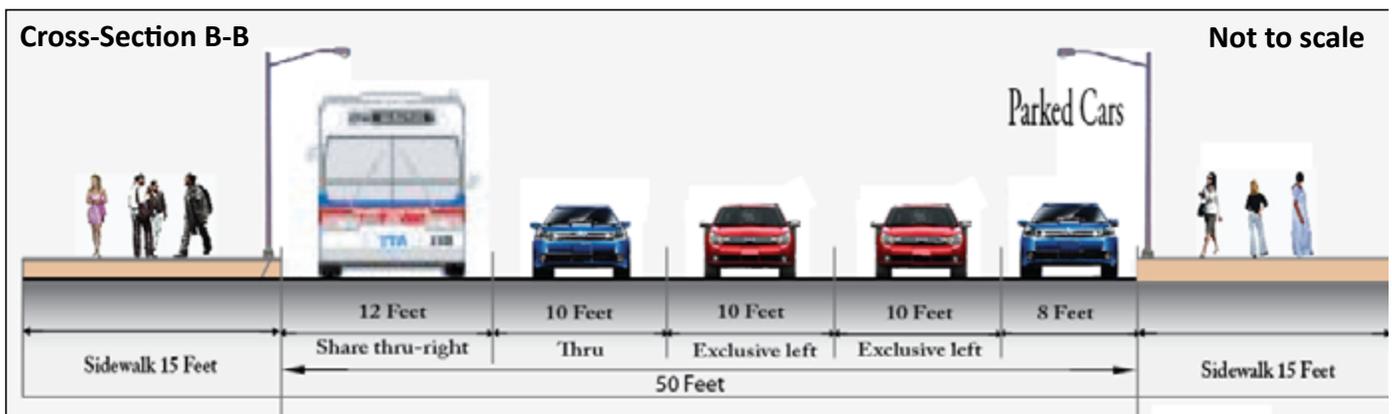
Proposed Configuration for West 66th Street approaching West End Avenue
